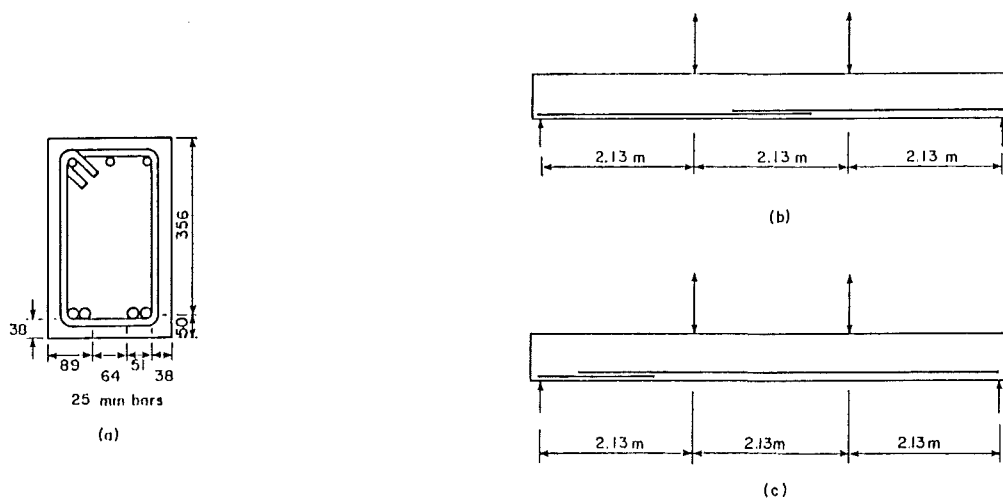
Beam Specimen Details (a) Typical Cross-Section (b) Splice in Constant Moment Region (c) Splices in Shear Region [16].
